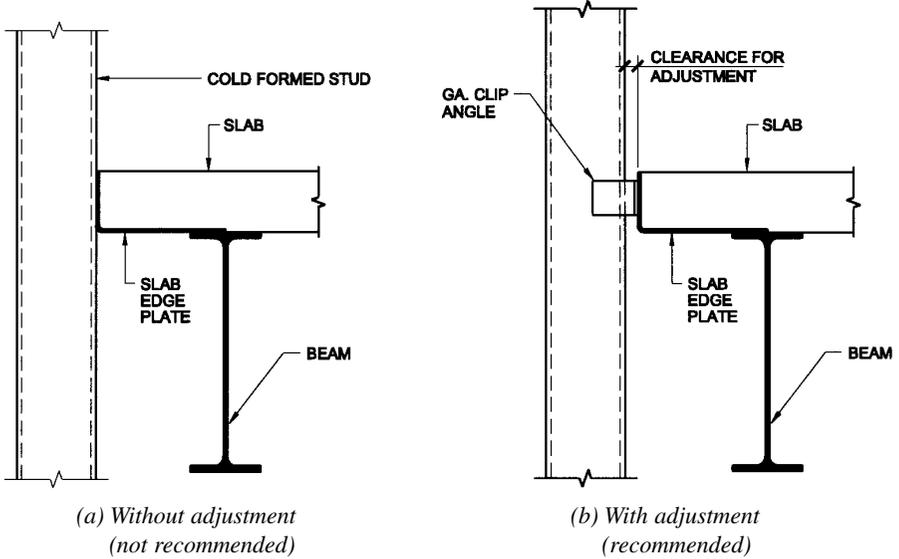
Attaching cold-formed steel façade systems to structural steel framing.
